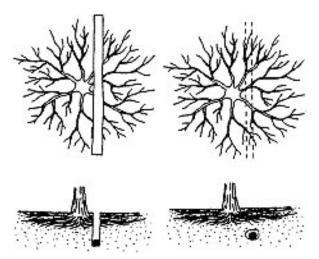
Trenching vs. Tunneling. Trenching near a tree (left) can kill almost half its roots. A tunnel or boring (right) in the same place will do virtually no damage to the tree. Source: Missouri Extension
